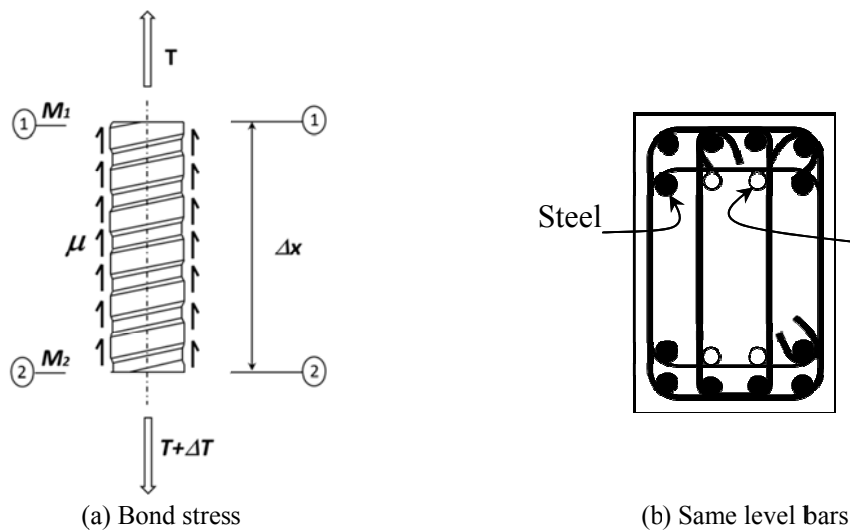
Bond stresses between a reinforcing bar and surrounding concrete
